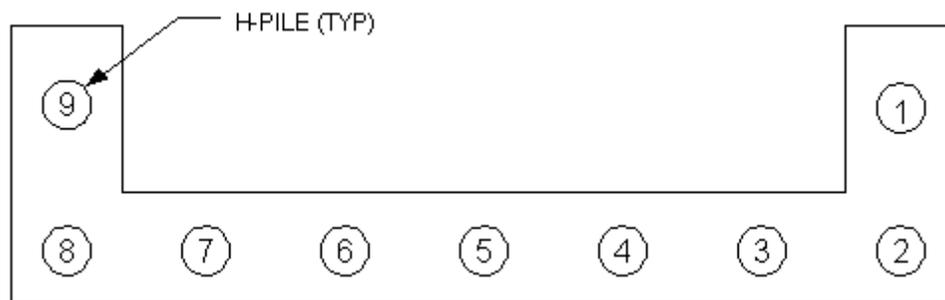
Track 1 Example 1: Pile arrangement at an abutment
